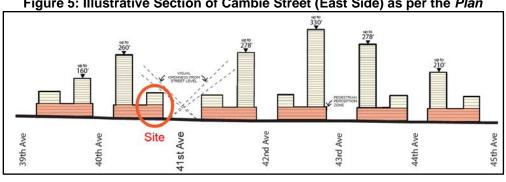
Illustrative Section of Cambie Street (East Side) as per the Plan
